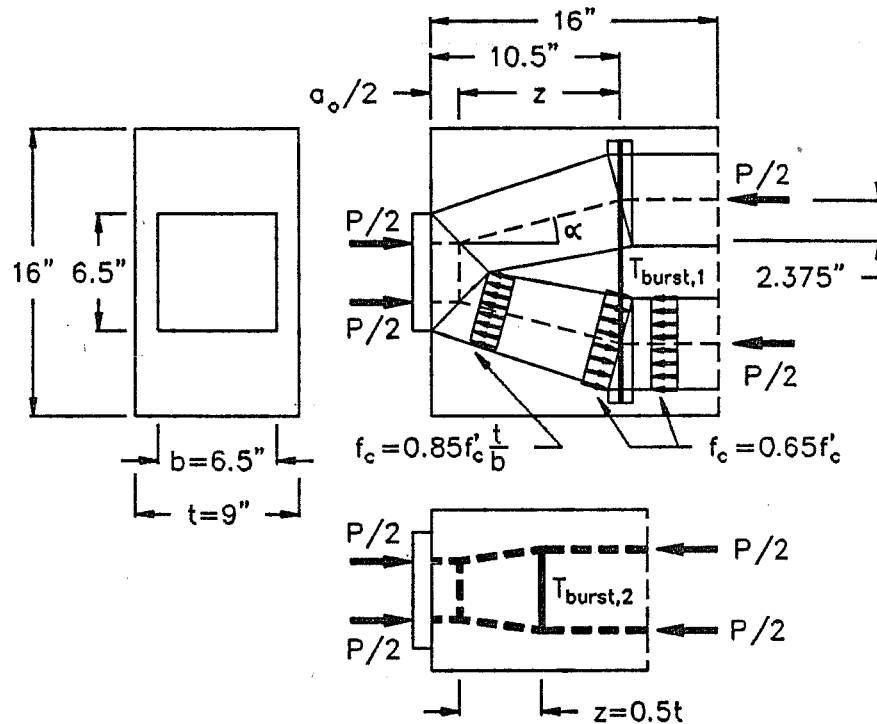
Strut-and-Tie Model for Specimen Beam1
